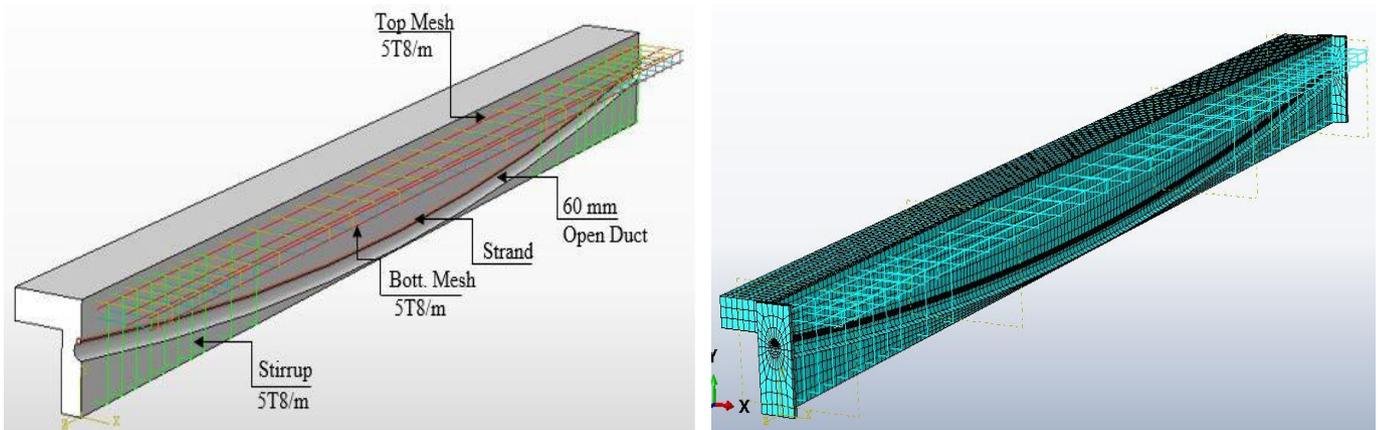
Typical Half Beam Detailed, Meshed with Simulated the Strand Curvature, End Anchor and Reinforcement.
